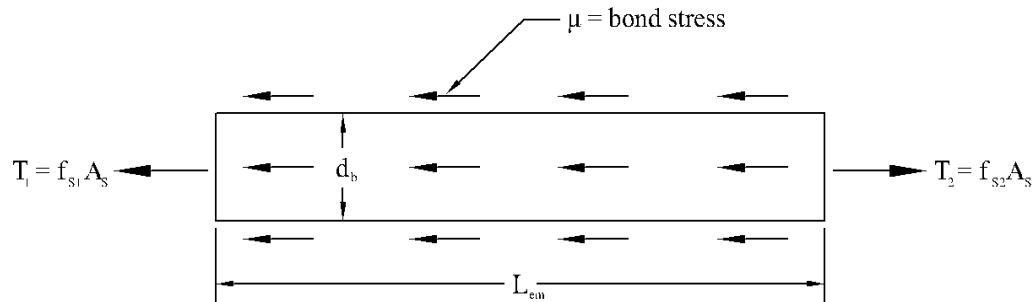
Forces acting on a segment of reinforcing steel
